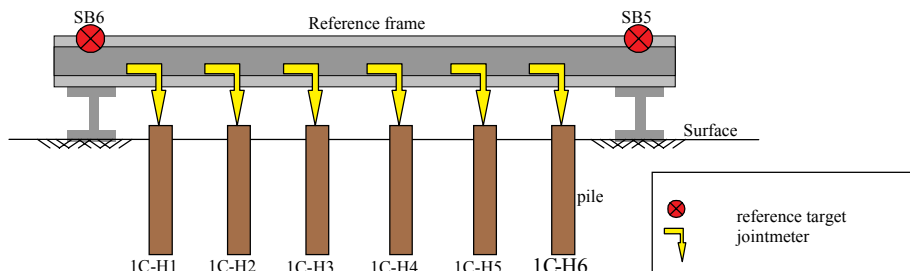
Typical Cross Section of Piles and Reference Frame
